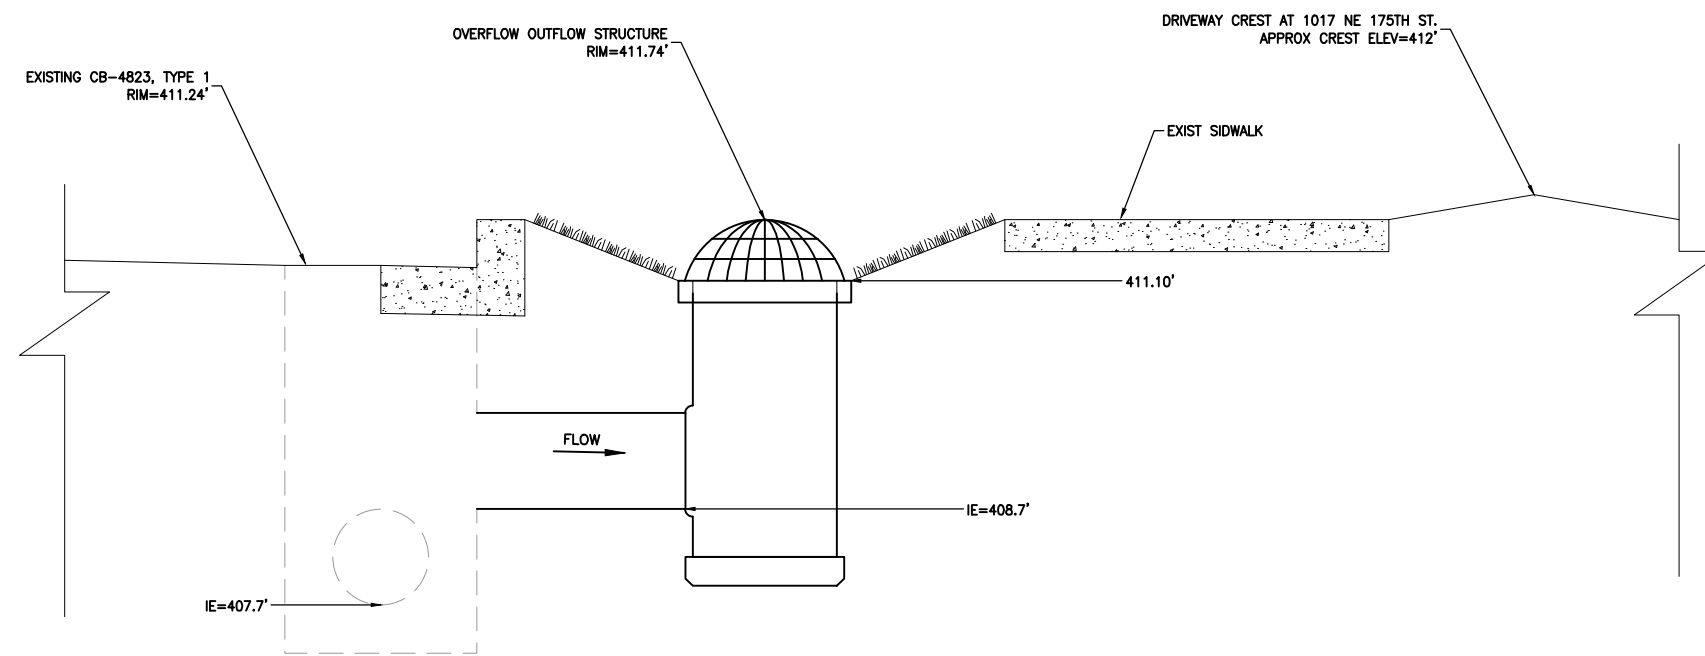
OVERFLOW OUTFALL STRUCTURE SCHEMATIC DETAIL
